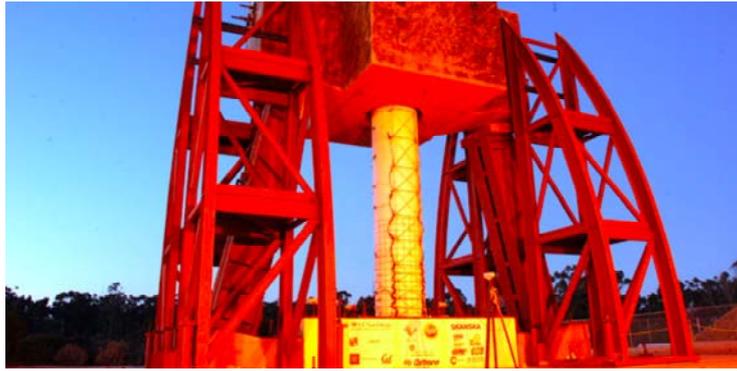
Full-scale Bridge Column on the University of California, San Diego NEES@UCSD Shake Table
